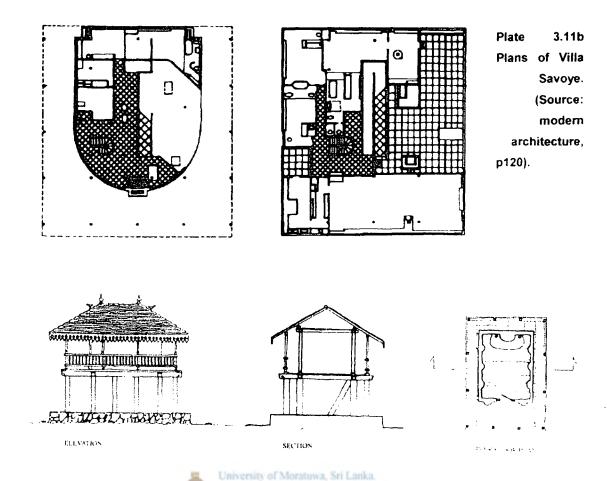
Plan and sections of a tam pita vihara (Dorabavila). (Source: Architecture of an Island, p120).
